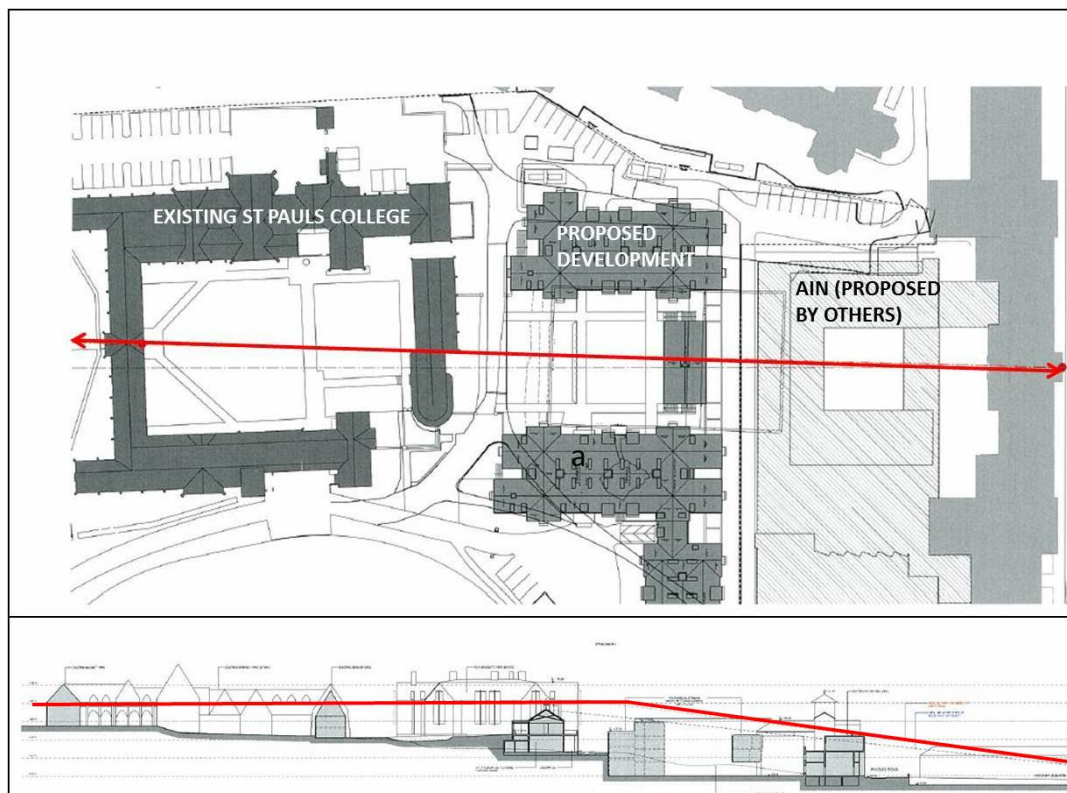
Plan and section views of Wilkinson Axis overlay onto proposed development
